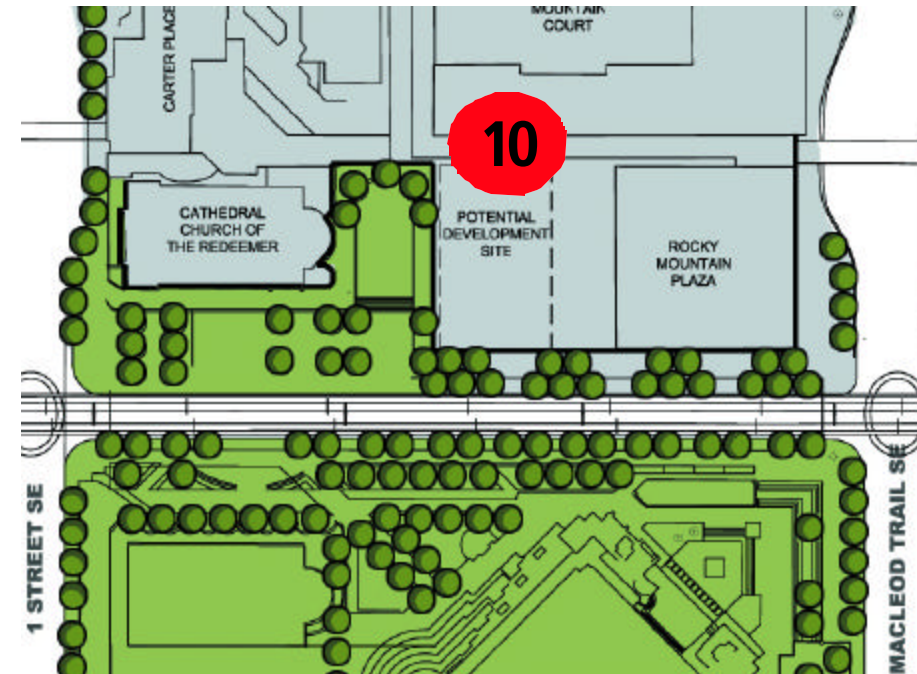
, Site 10 at the +15 level, mid block between Macleod Trail and 1st Street East (Block M)
